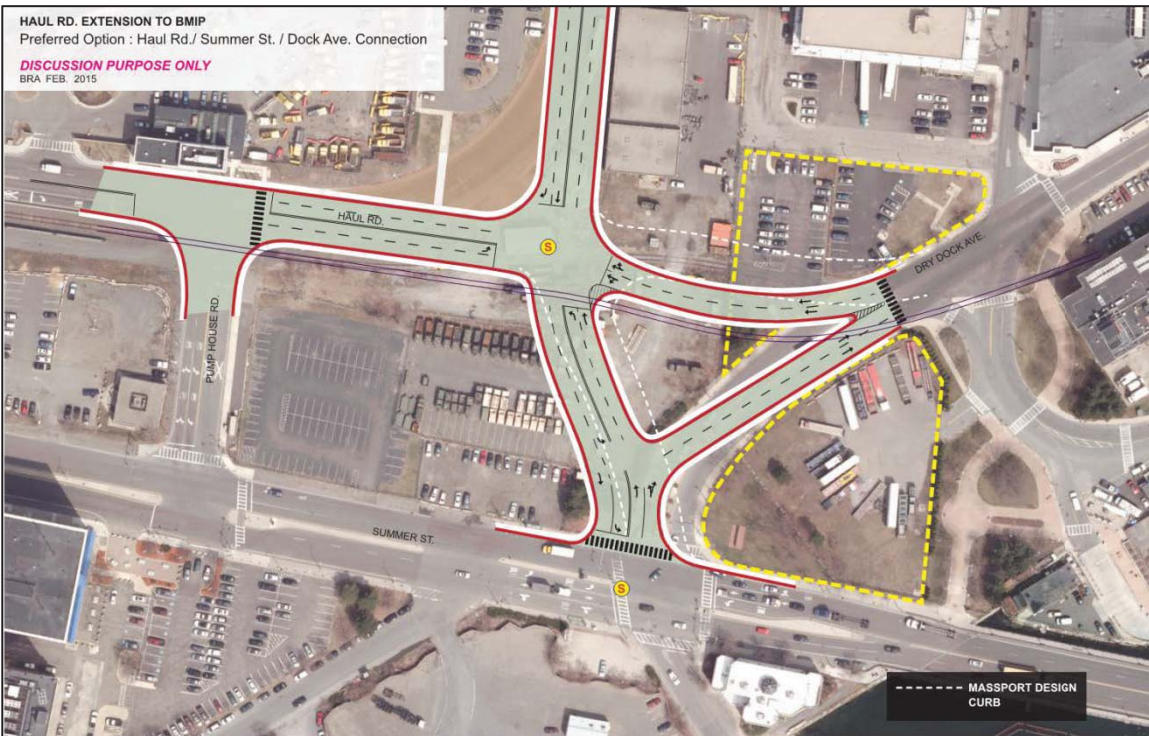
Conceptual layout for improved road connections at the southern entrance to the BMIP; between the Massport Haul Road, Summer Street, and Dry Dock Avenue.
